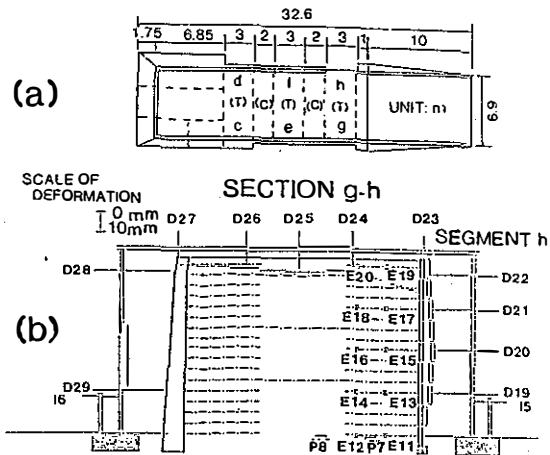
(a) Plan (T; test section, and C; control section) and (b) one section of No. 1 embankment (sand).
